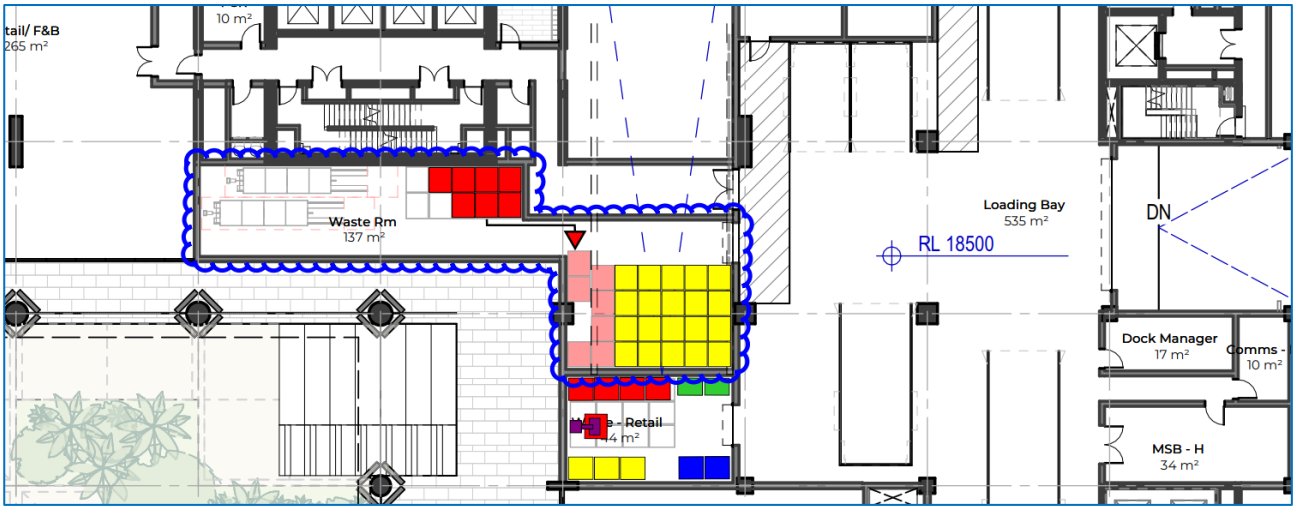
Tower 2 Refuse Discharge, Storage and Collection Room
